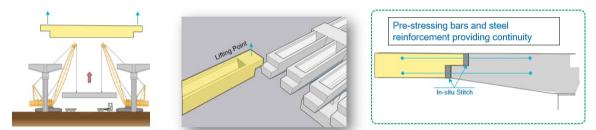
Lifting and connecting pre-cast U-beams to RC crosshead
